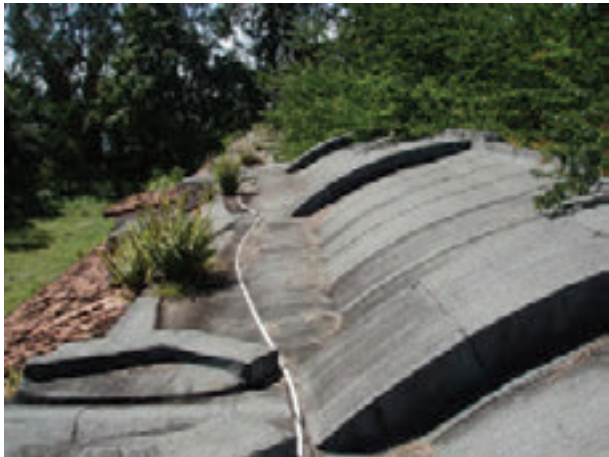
Original roof covered with Modified Bituminous roofing that is currently leaking.
